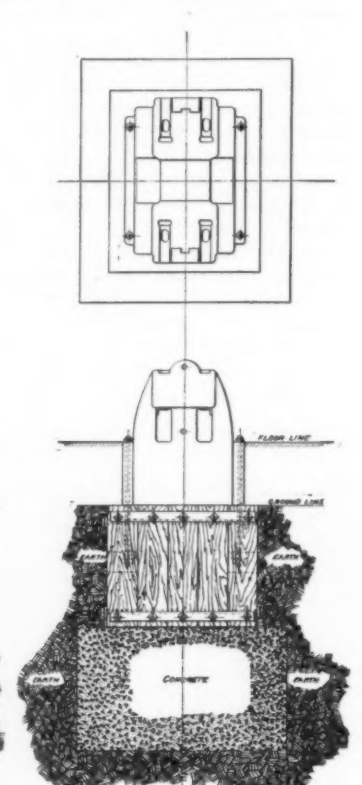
PLAN AND SECTIONAL ELEVATION OF DROP-HAMMER FOUNDATION WITH WOOD CUSHION.
